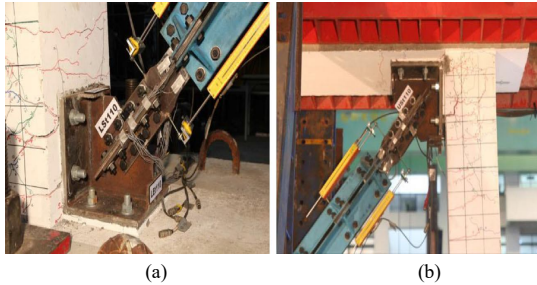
Cracking of concrete close to (a) lower and (b) upper anchor brackets during opening corner moments [4]
